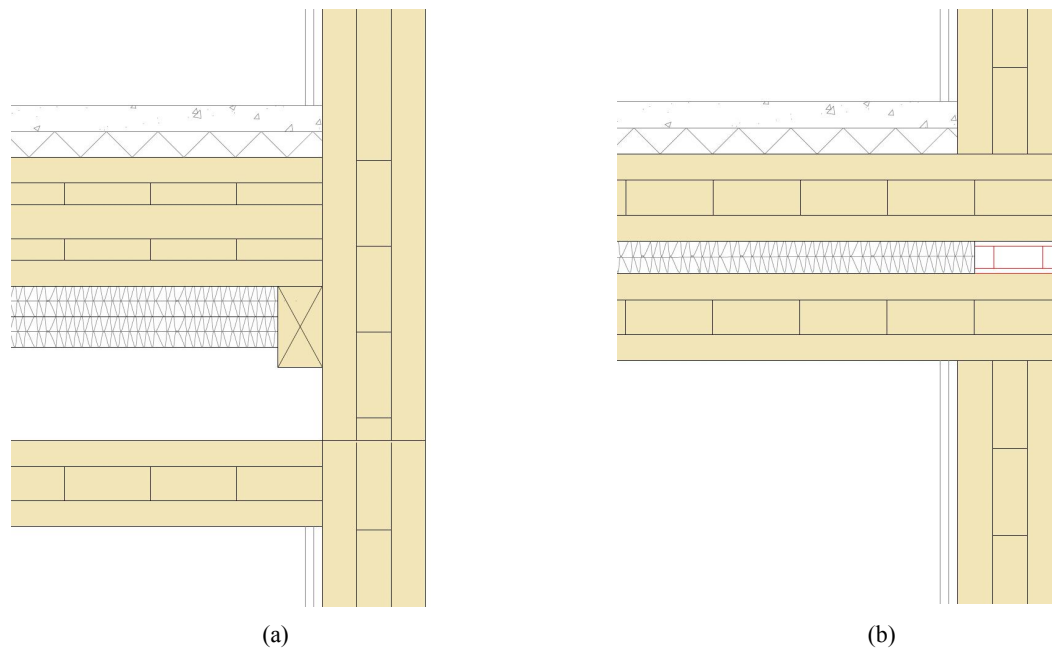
The joining details of (a) conventional CLT volumetric structures and (b) CLT volumetric structures with interlocking connections
